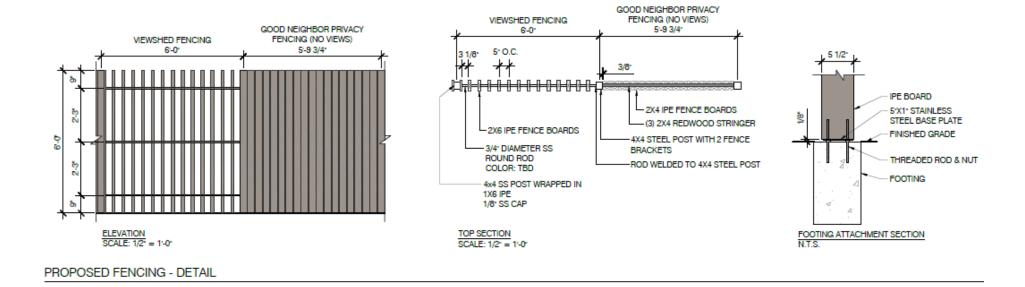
Viewshed Fencing Detail (Source IX.1)
